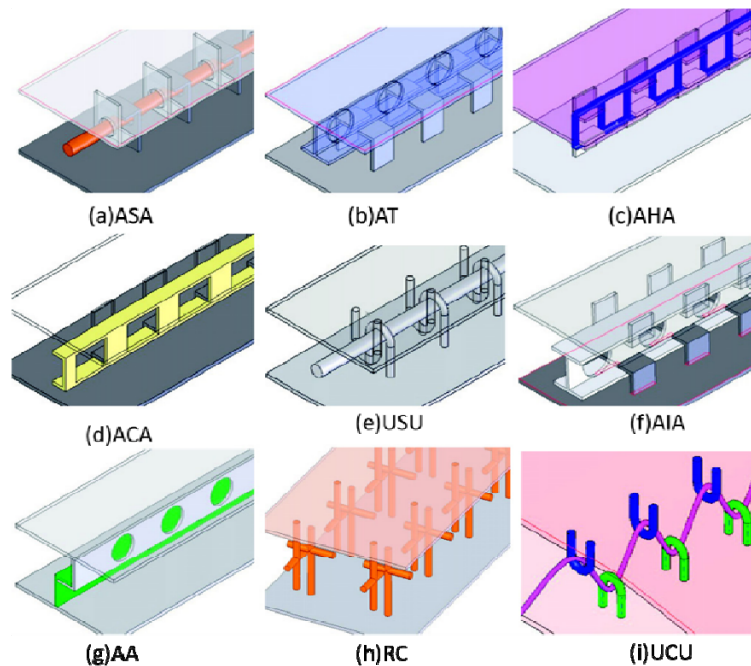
Proposed mechanical connectors used in steel-concrete-steel sandwich panel.
